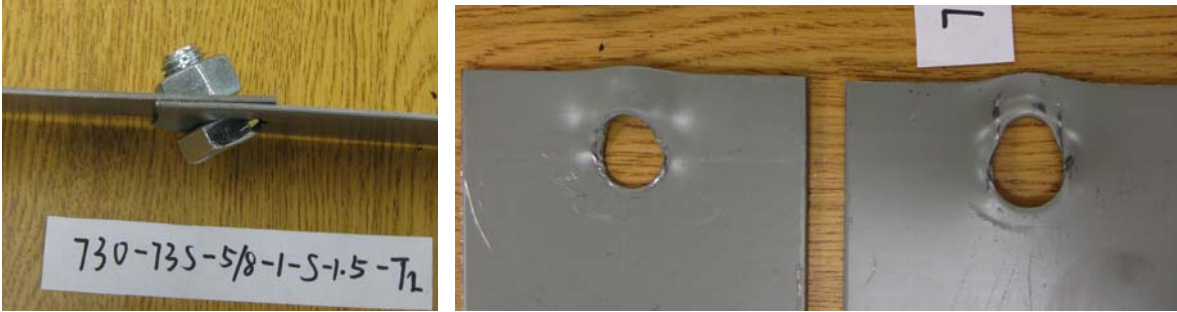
Shear Failure of Test Specimen 730-73S-5/8-1-S-1.5-T2
